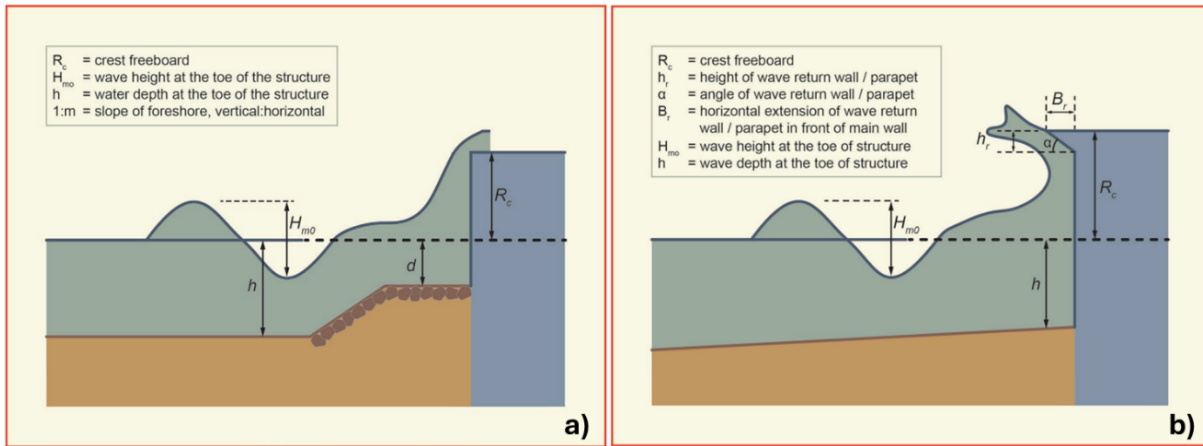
EurOtop (2018) schematics for vertical walls with various additions: (a) toe berm, and (b) wave return wall/bullnose
